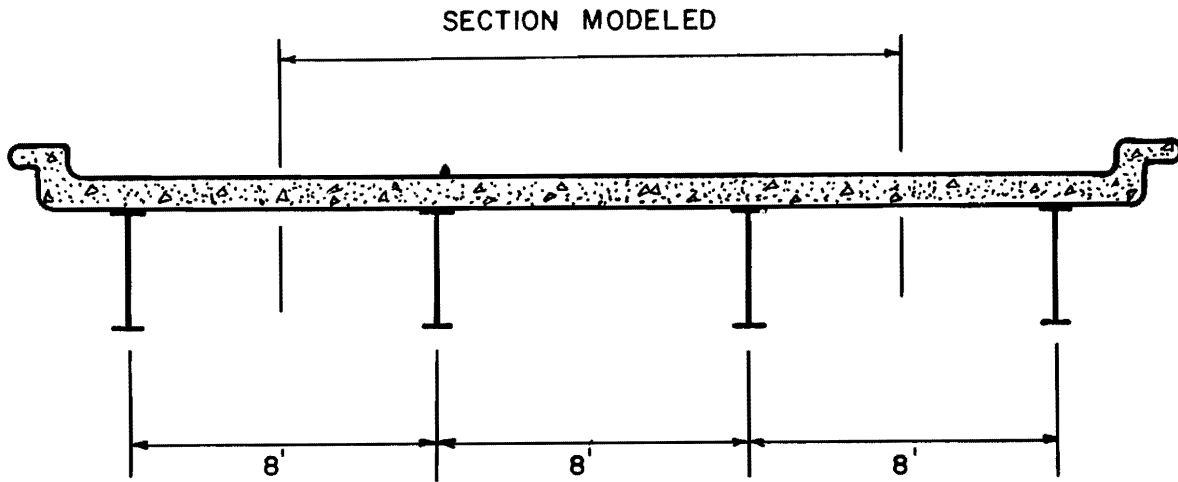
Details of Prototype Bridge. Texas Highway Department (4).
